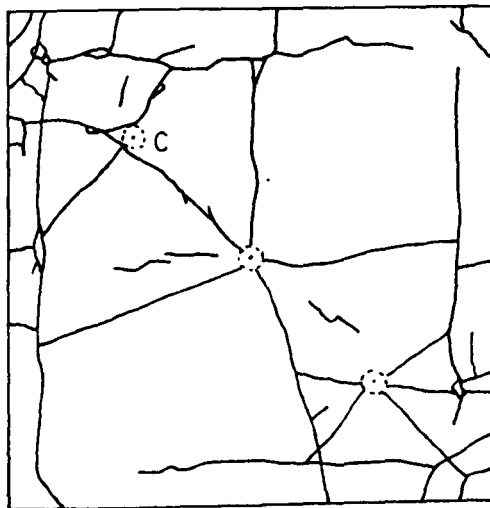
CRACKS IN A BARYTES CONCRETE SLAB AFTER 3 SHAPED CHARGE JET IMPACTS
